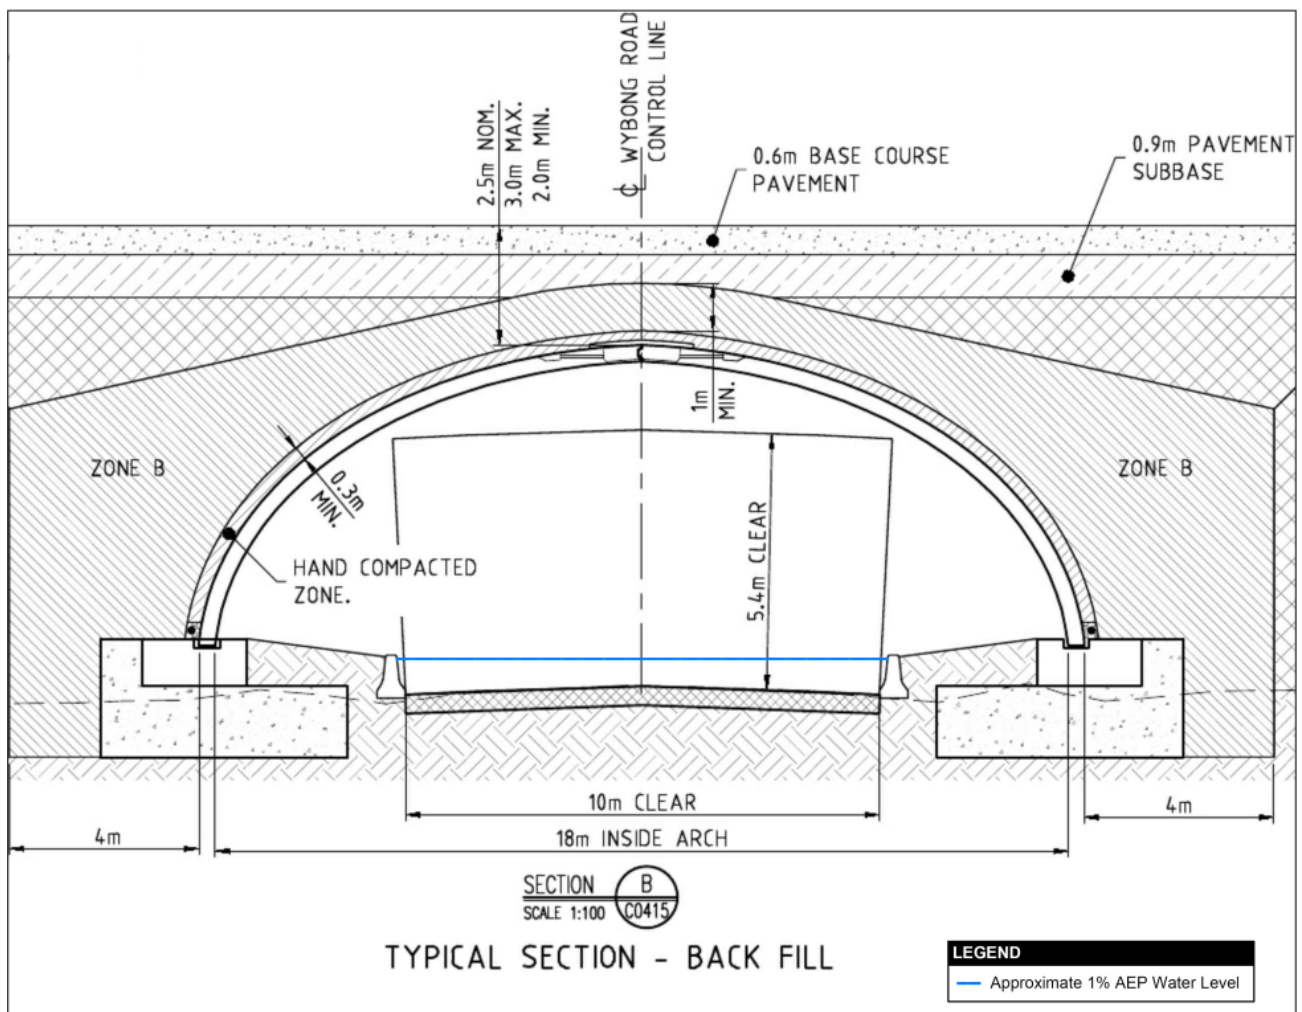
Wybong Road Overpass Conceptual Design Cross-Section
